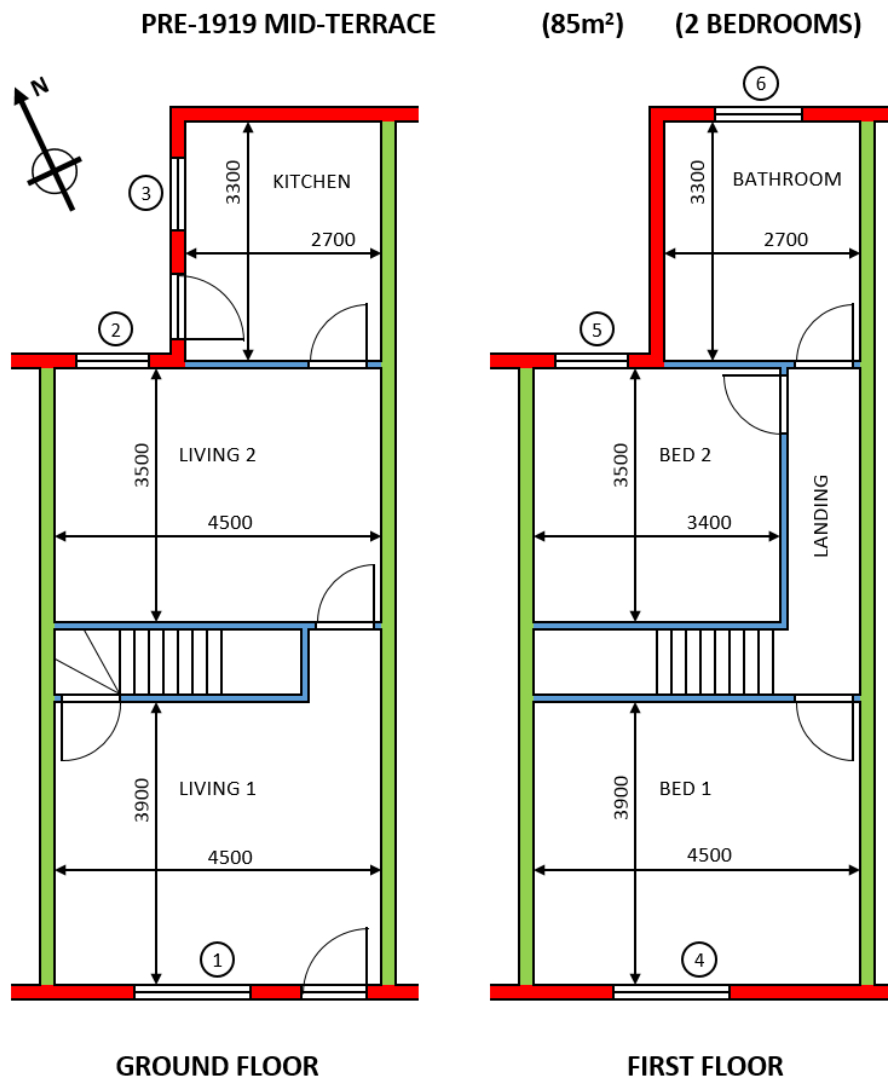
Pre-1919 mid terrace – building layout. Window references are numbers in circles; red walls are external, blue walls are internal and green walls are party.
